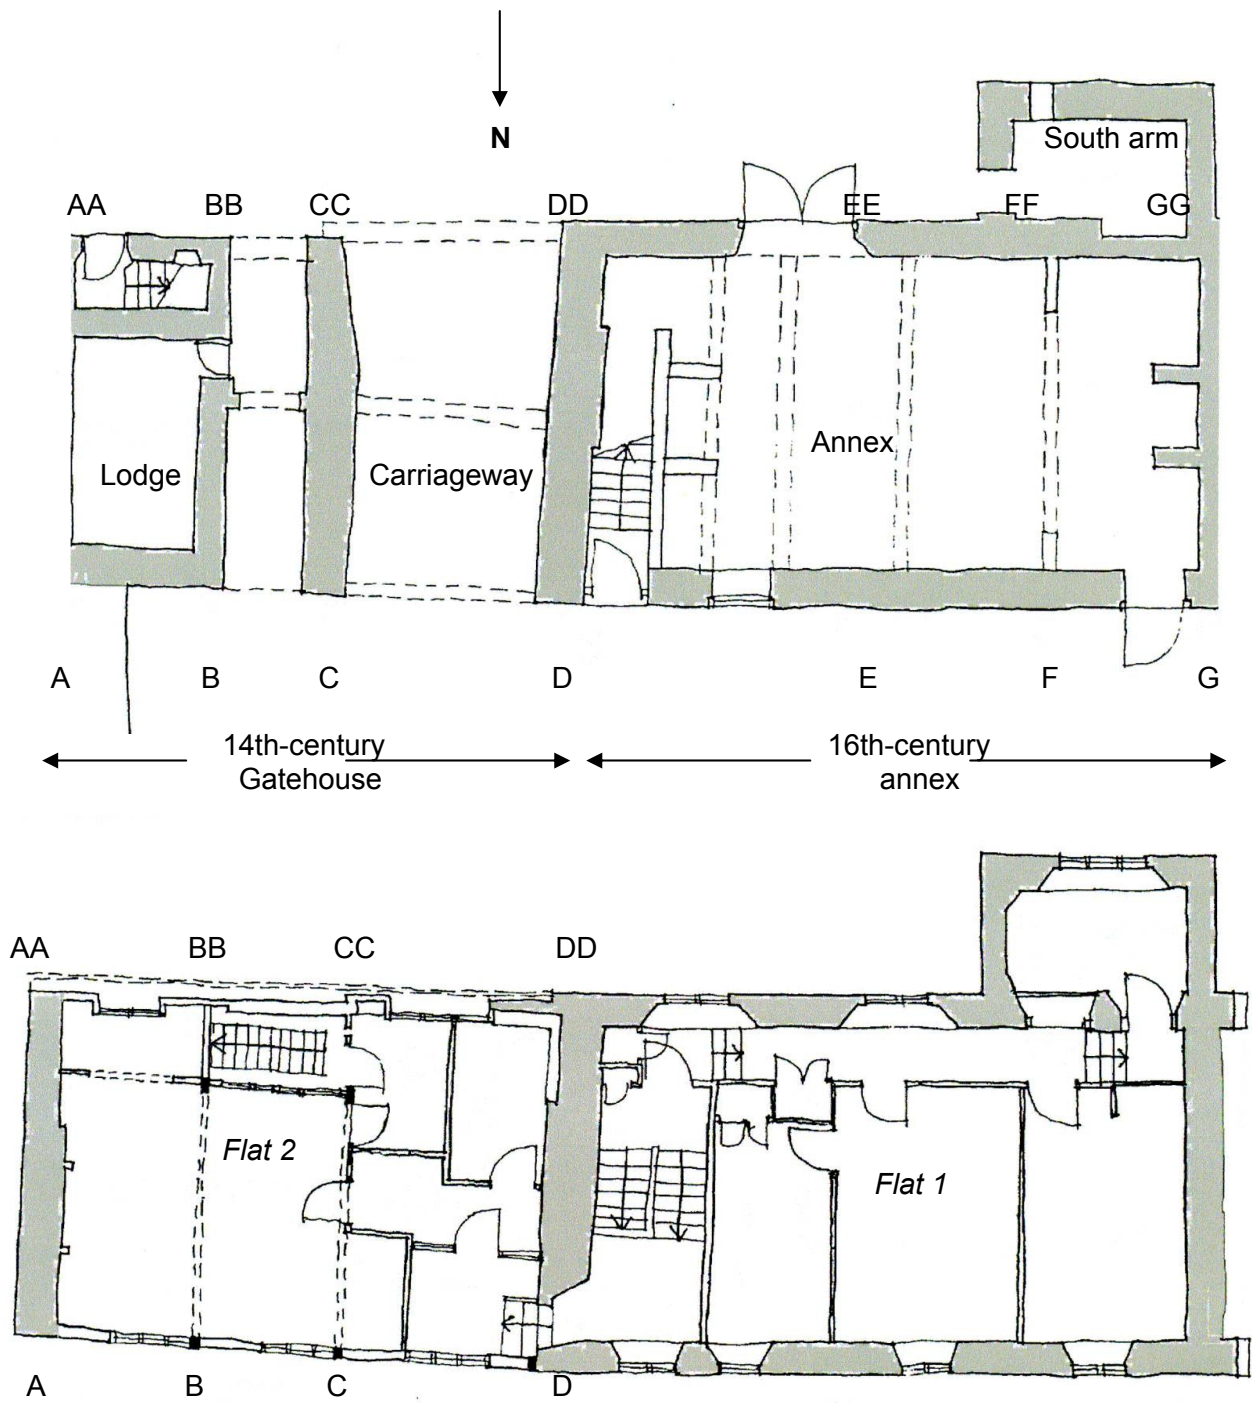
Schematic plans of ground floor (top) and first floor (below) (after Jean and Bob Meeson)
